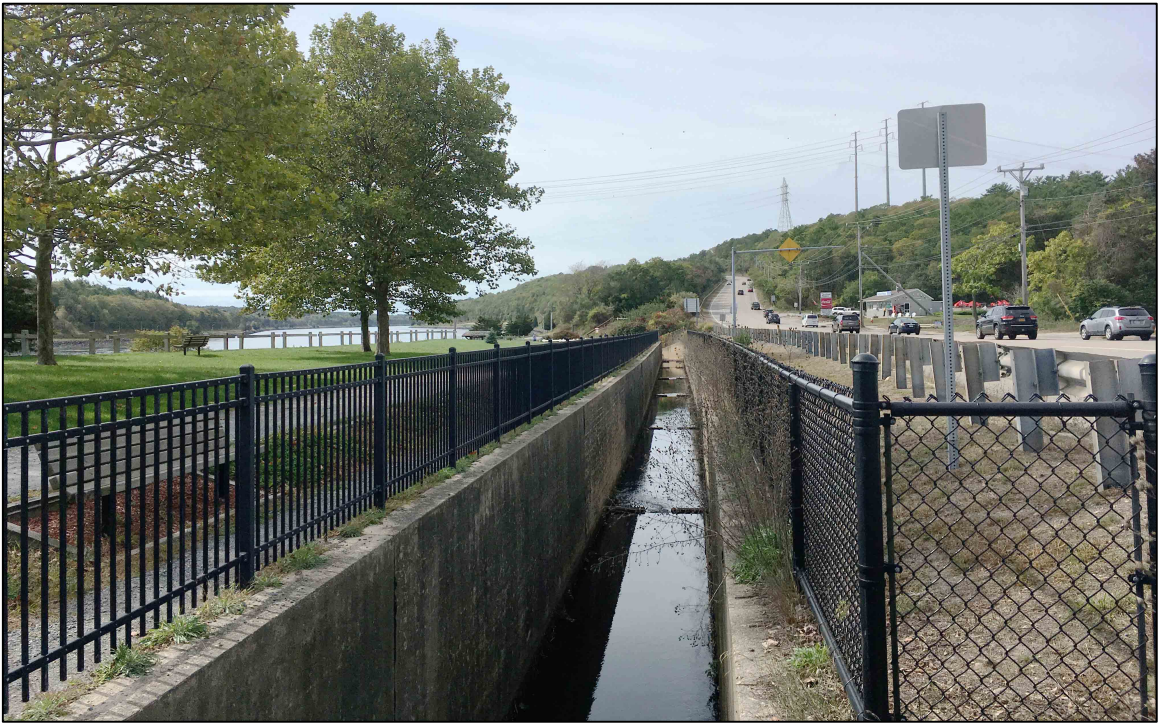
Burying Hill (BOU.920) on Old Herring Pond Road, camera facing northwest.
